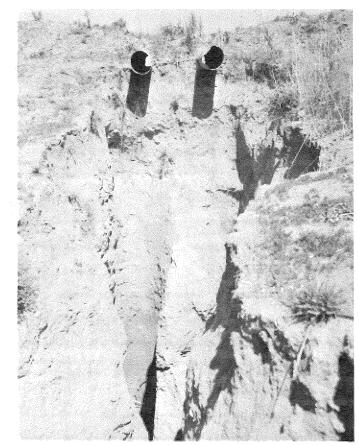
Head of the gully shown in Photo 19. Erosion is due to runoff from road above culverts.
